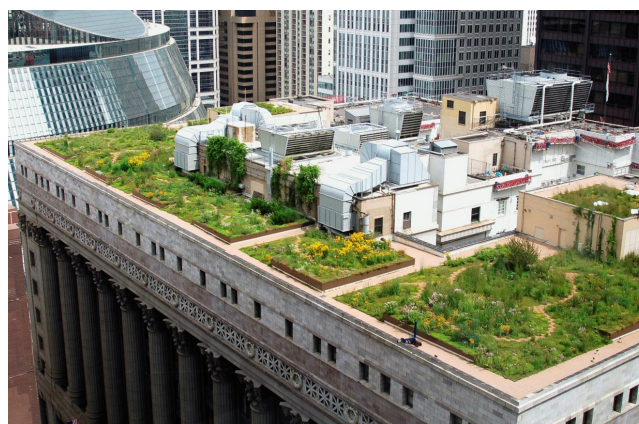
Green roof on the Chicago City Hall, a highly visible example of a public building showcasing heat mitigation (U.S. Department of State)
